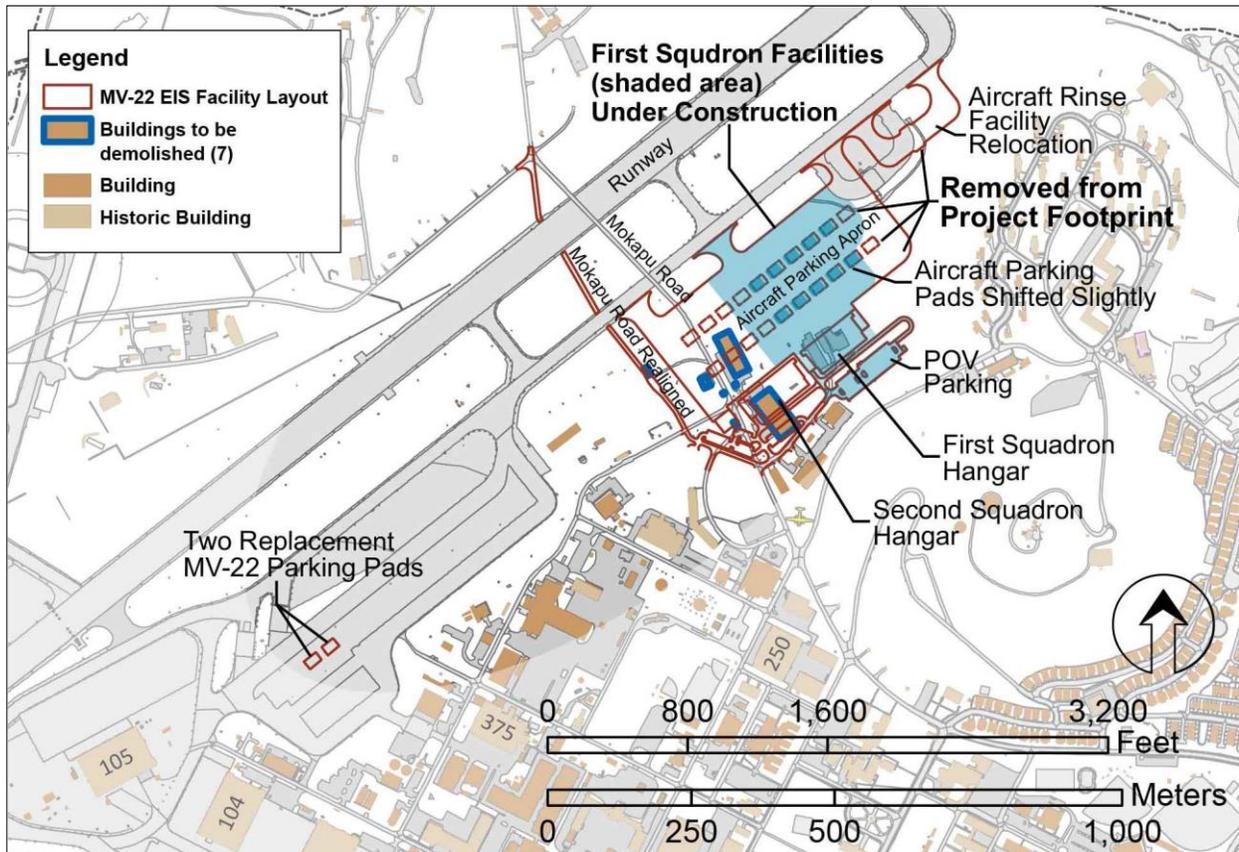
No-action alternative/ revised MV-22 EIS site plan
